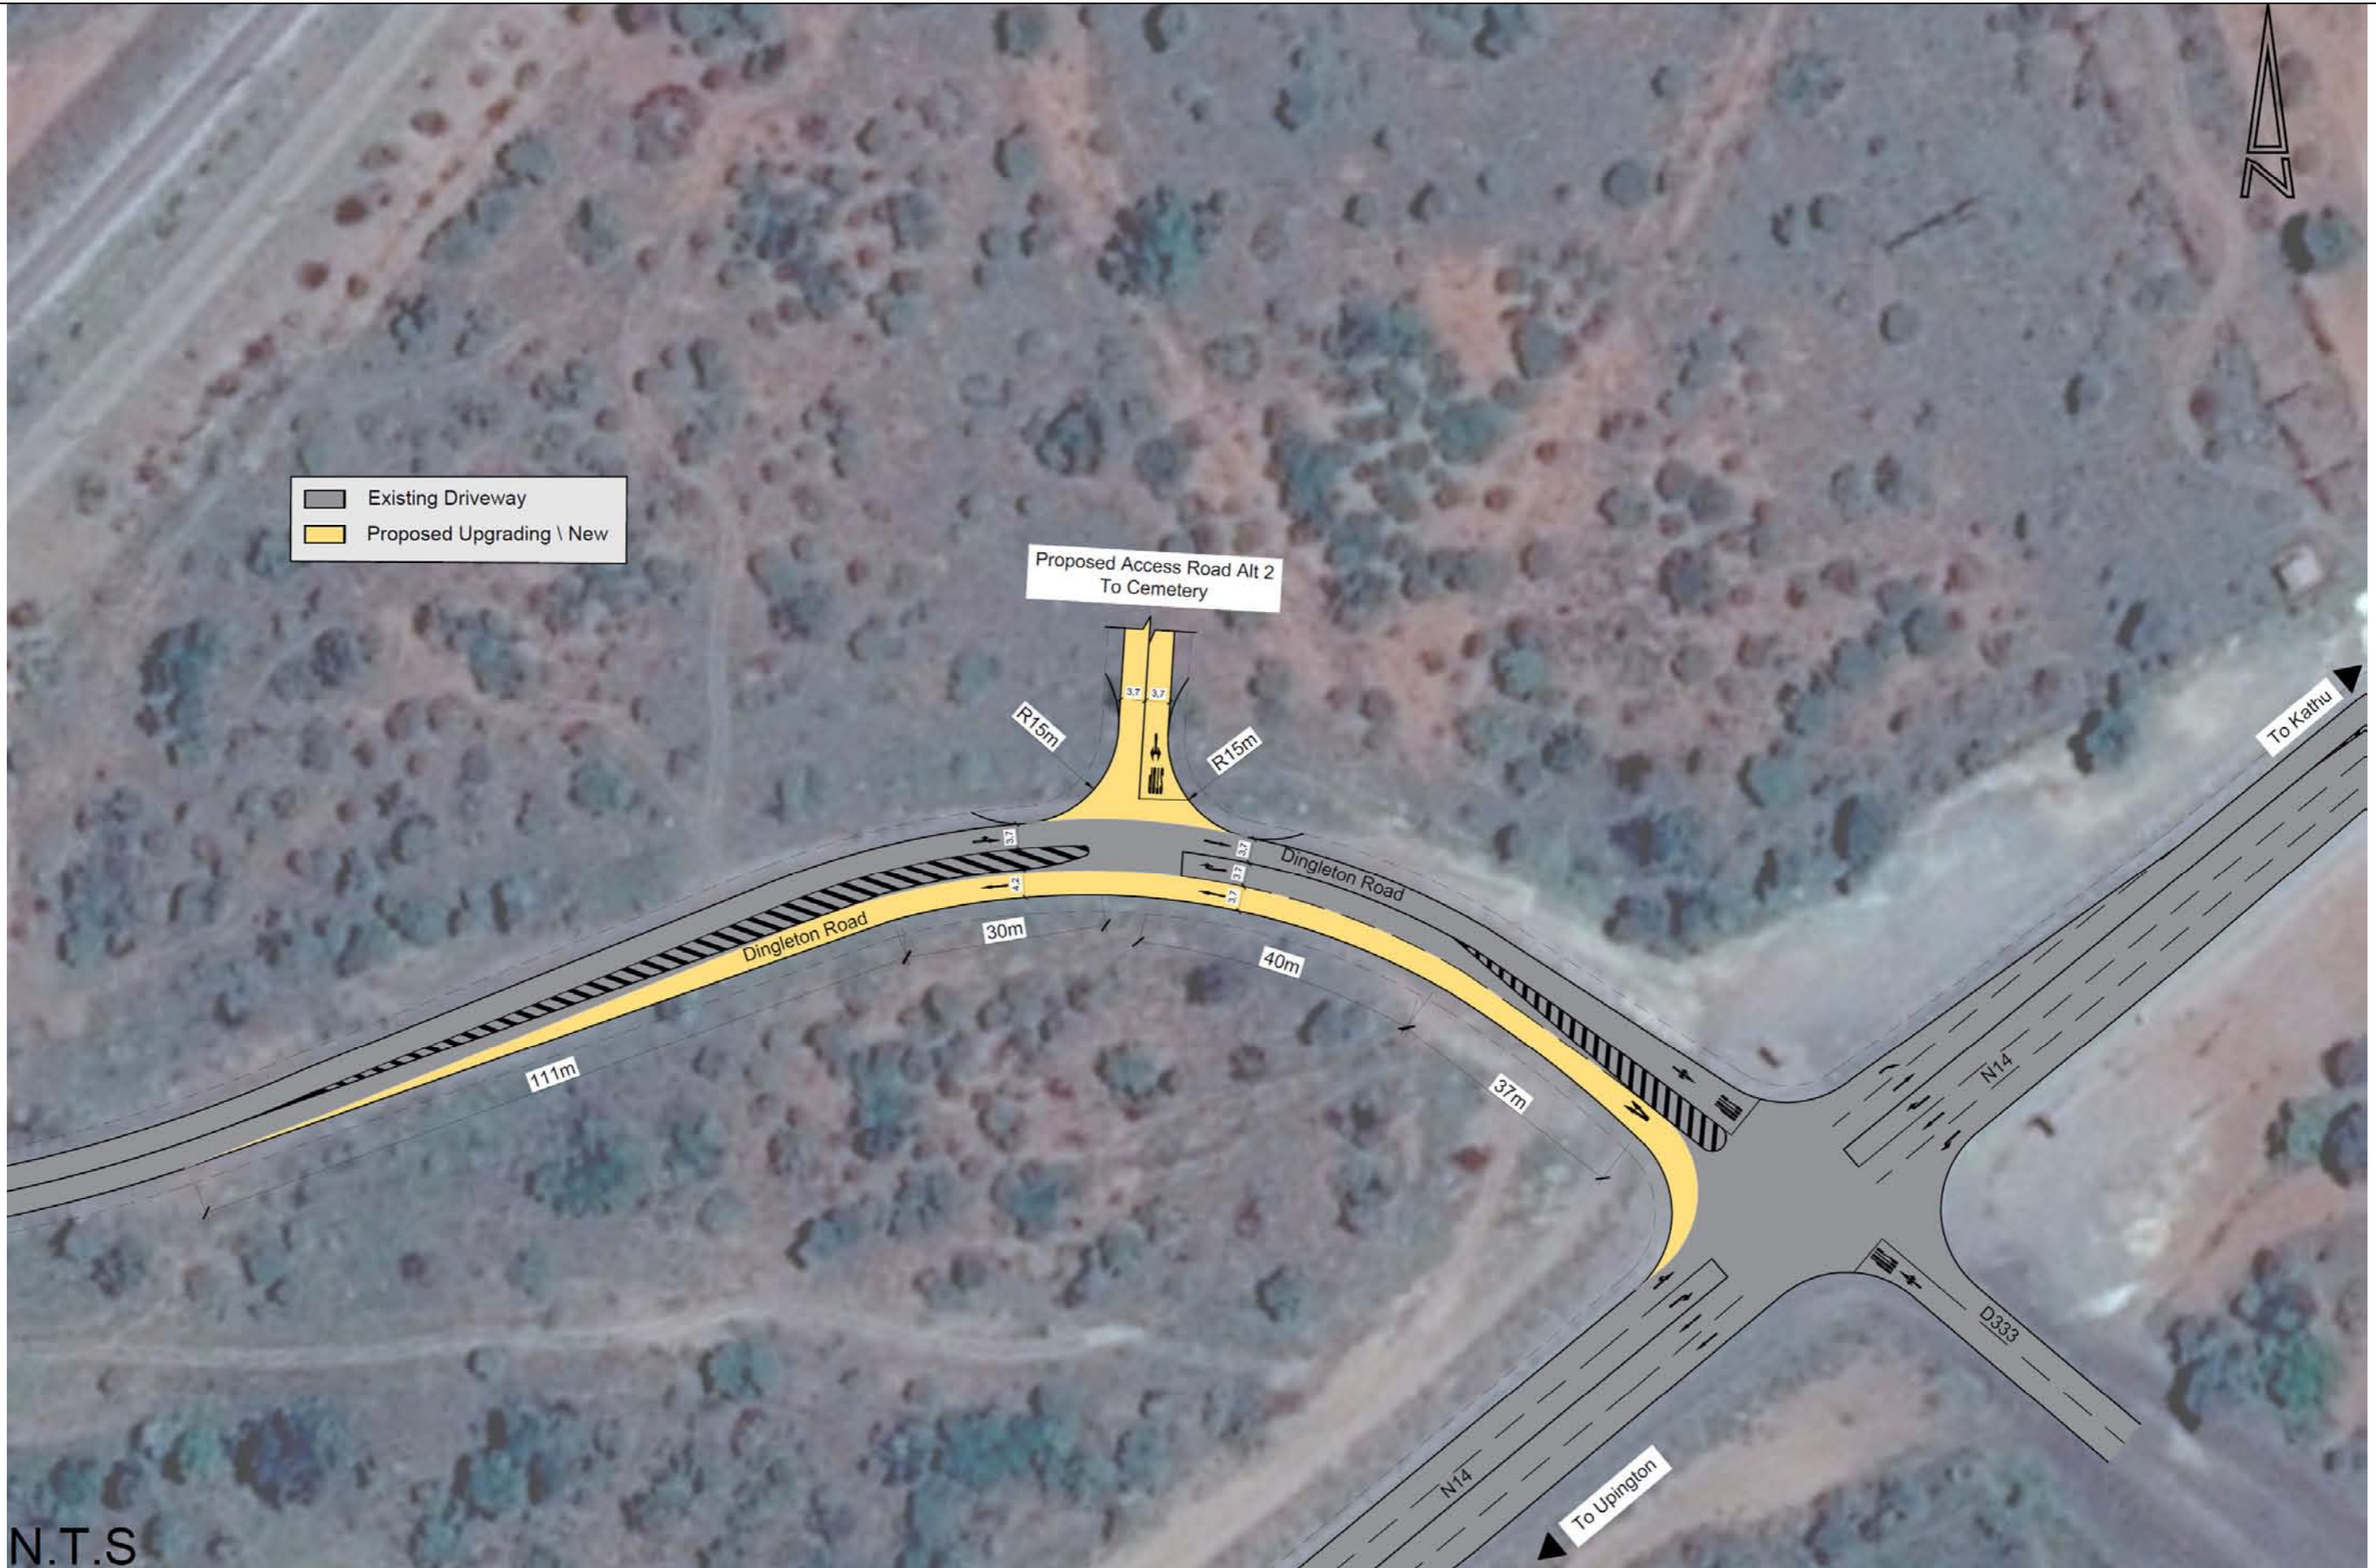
LAYOUT REQUIRED WITH THE PROPOSED DEVELOPMENT SHOULD ACCESS BE GAINED FROM DINGLETON ROAD (ACCESS ALTERNATIVE 2)
